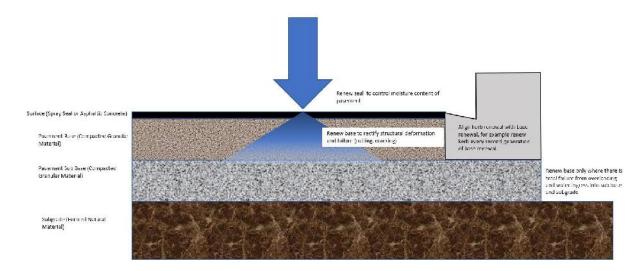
Road Pavement Renewal for Light Traffic Pavements (sub base is never renewed)
